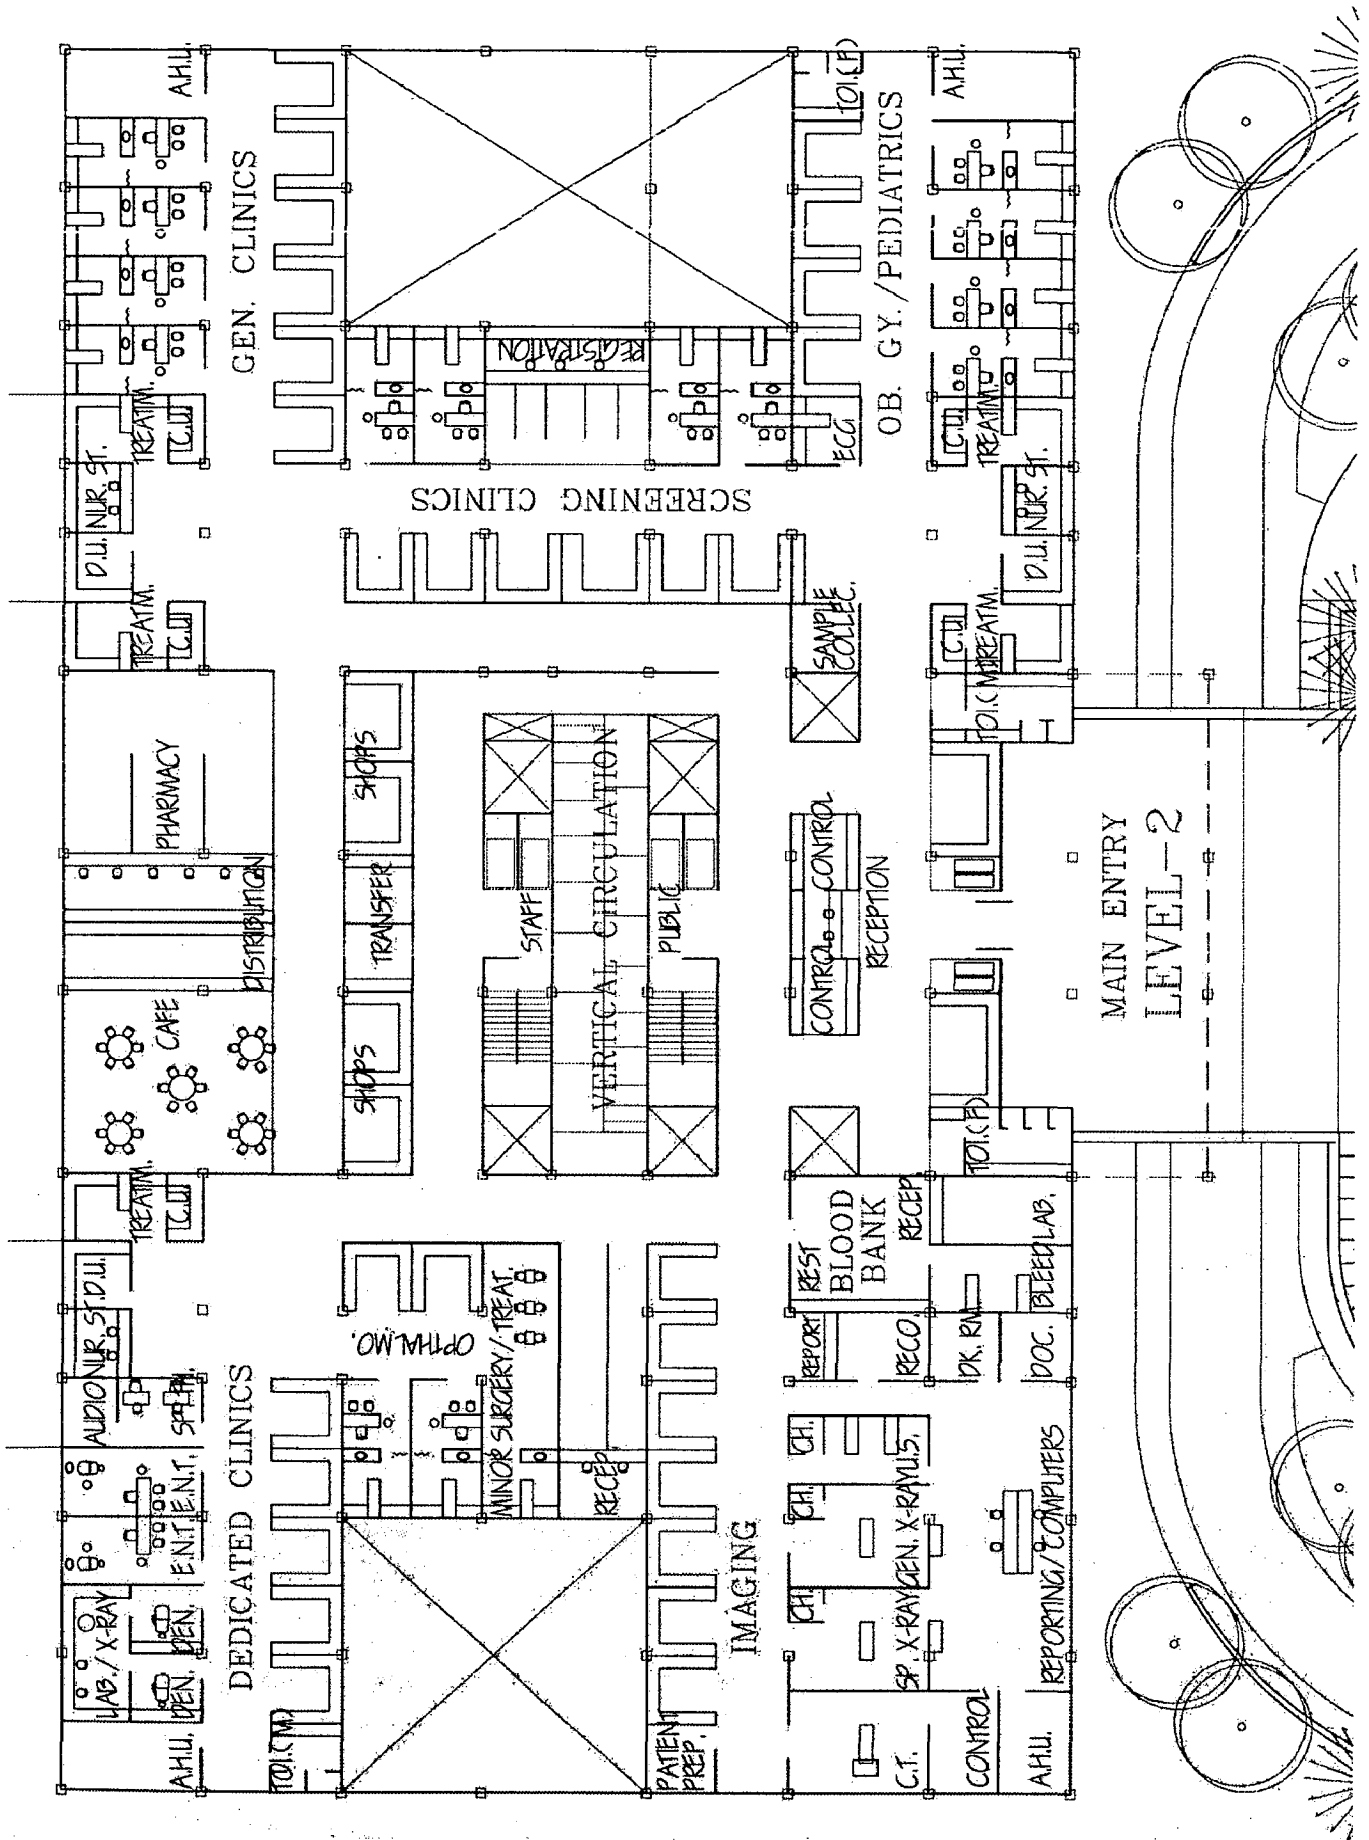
CITY HOSPITAL – GROUND FLOOR PLAN
